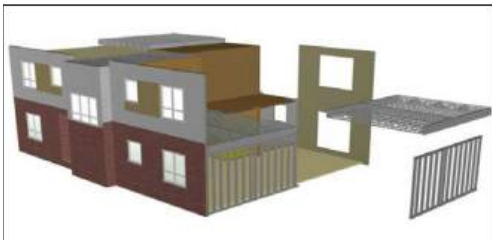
'Hybrid' modular and panel building showing planar floors and walls attached to the modules
